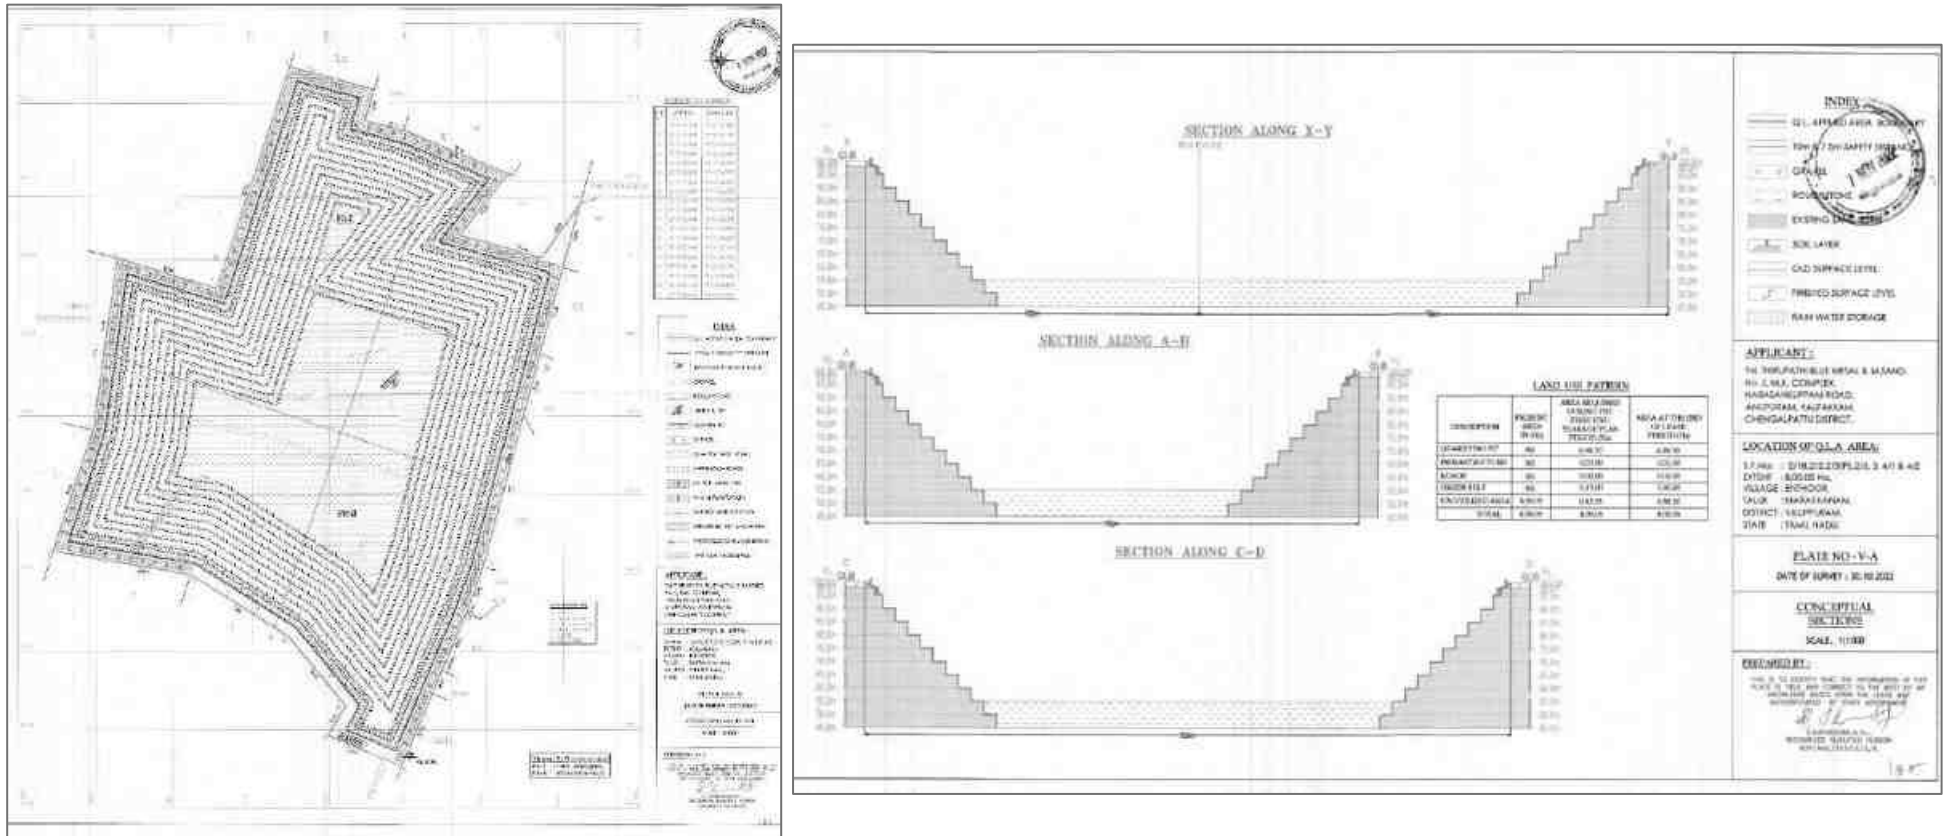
A: CLOSURE PLAN AND SECTIONS – P2
